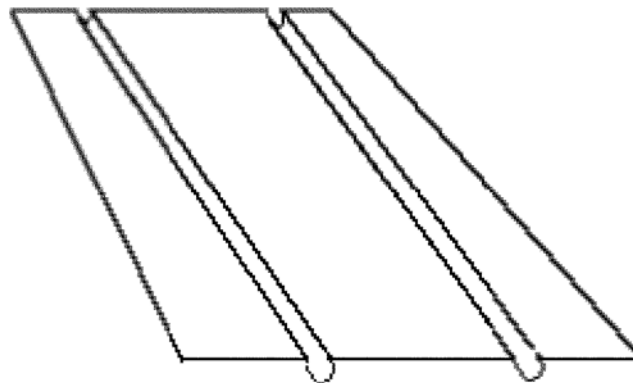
THE PANEL CAN BE STAPLED BETWEEN JOISTS TO FLOORING BOARD FROM UNDERNEATH
